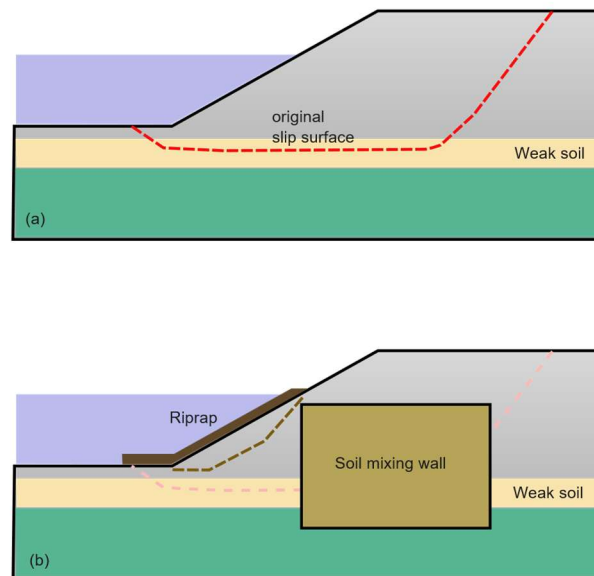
Slip surface (a) and soil mixing wall (b)
